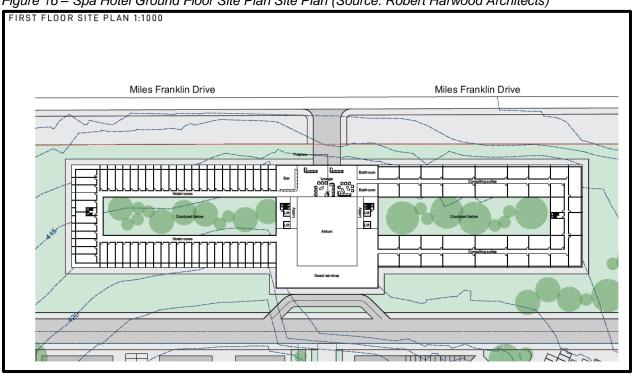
Spa Hotel First Floor Site Plan (Source: Robert Harwood Architects)
